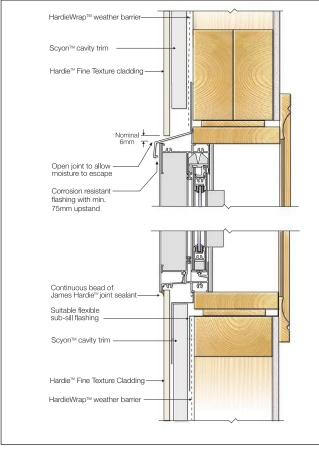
WINDOW HEAD AND SILL - CAVITY TRIM
